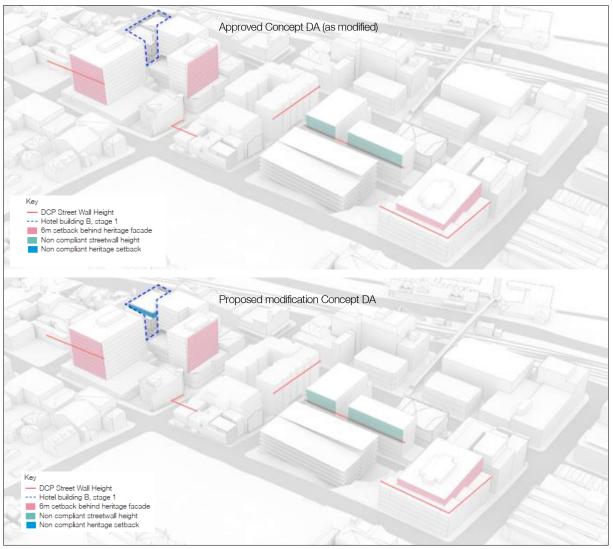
Comparison of approved (top) and proposed (bottom) street wall heights and upper level setbacks for former David Jones building within Stage 1 looking north west from King Street
